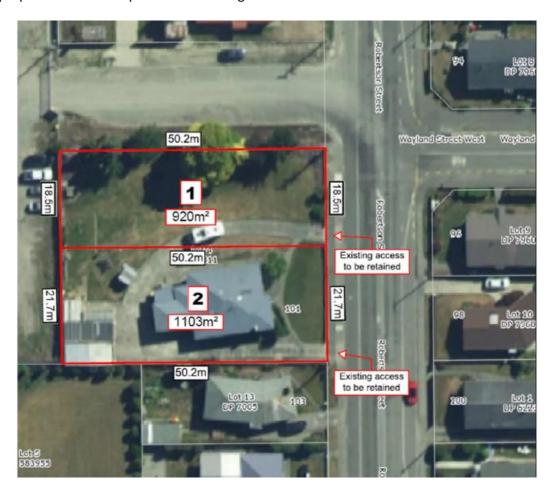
Subdivision site plan (Source: Applicant's AEE)
